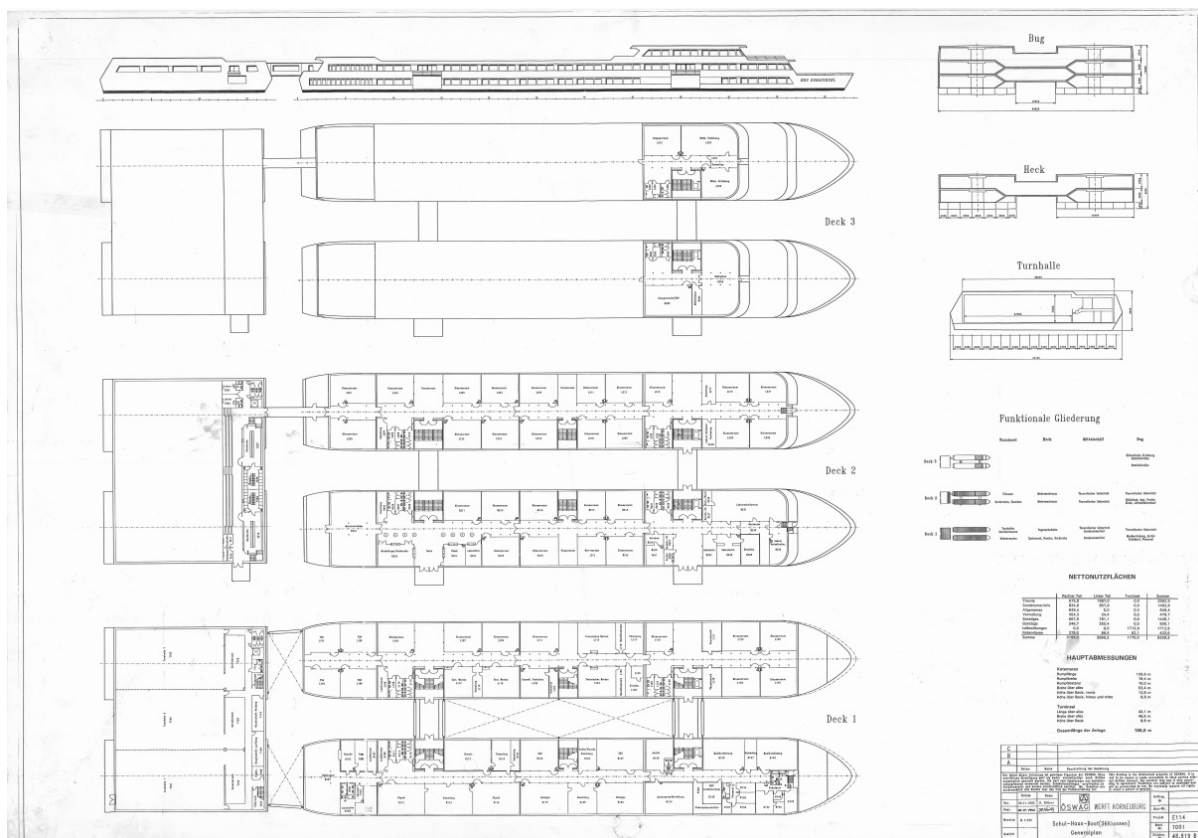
Design drawings – side view, deck plans and cross section drawings; source: the archive of Bertha von Suttner Gymnasium
